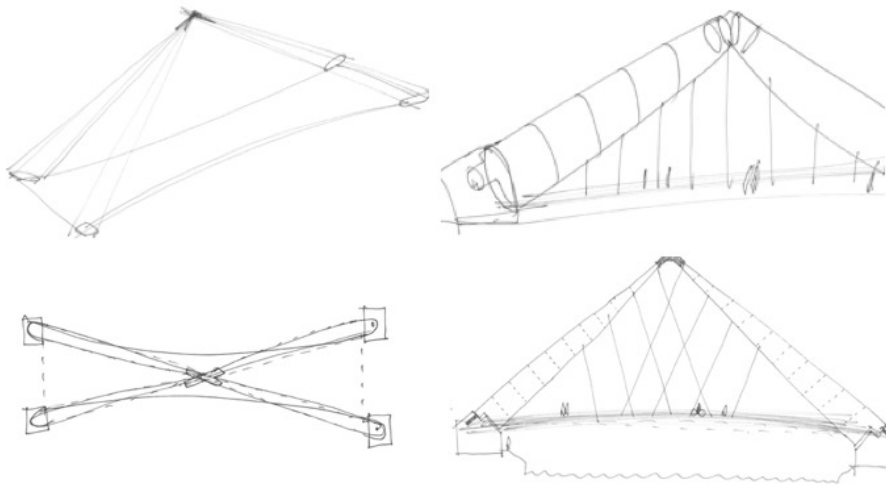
Sketch of bridge concept three. Architect: Pege Hillinge, Sweco.
